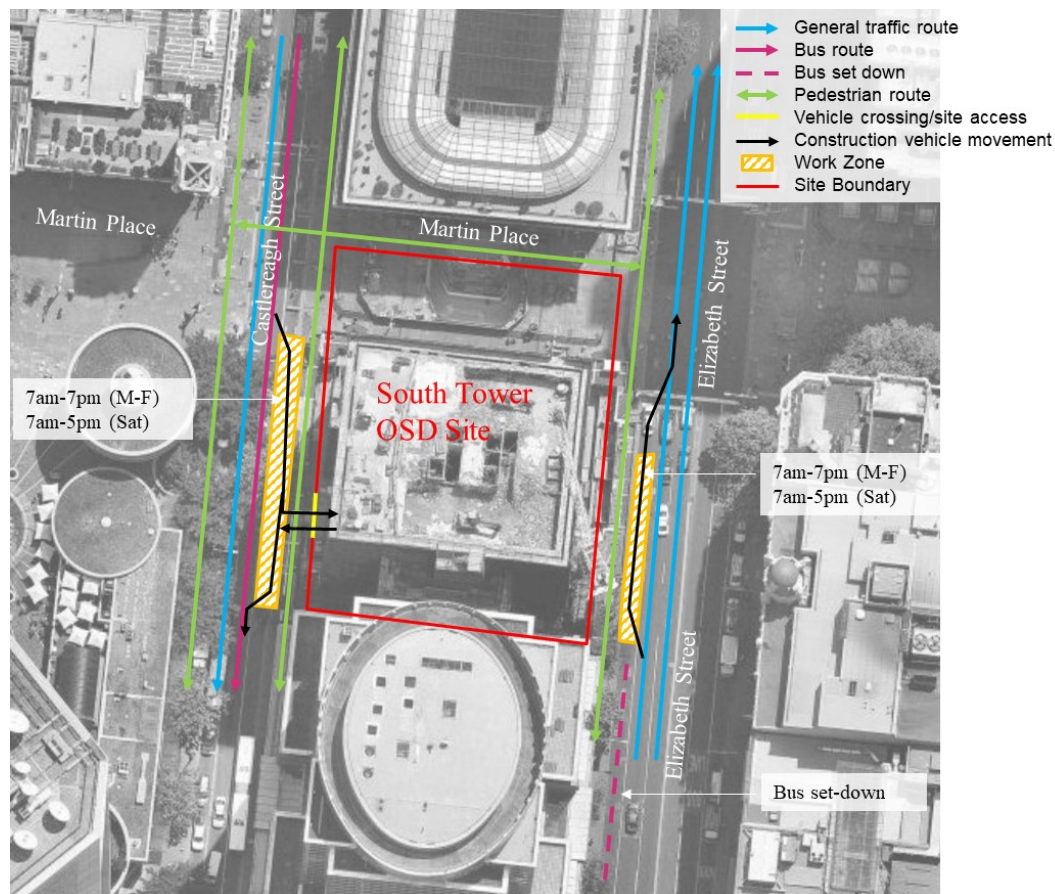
TSP 2 Site Access and Traffic Staging Plan
